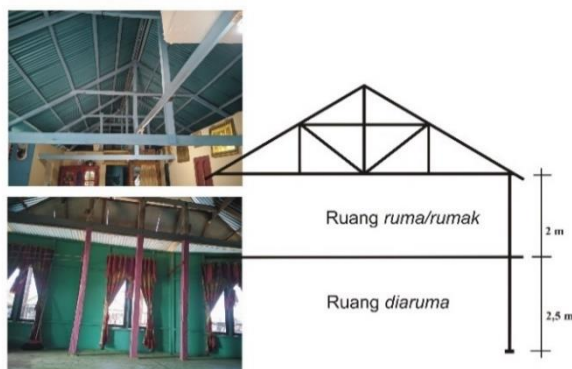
Structure of the Truss and Ceiling of the Bajo Tribe's Stilt House
